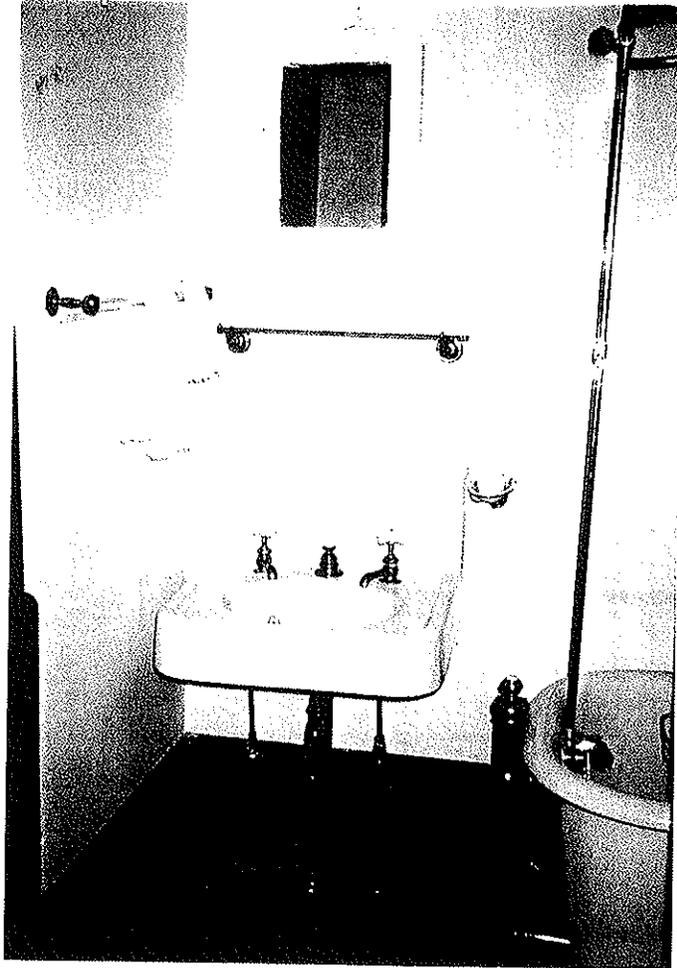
Weir House - First-Floor Bathroom [Room 109], Southwest Corner (1994).
